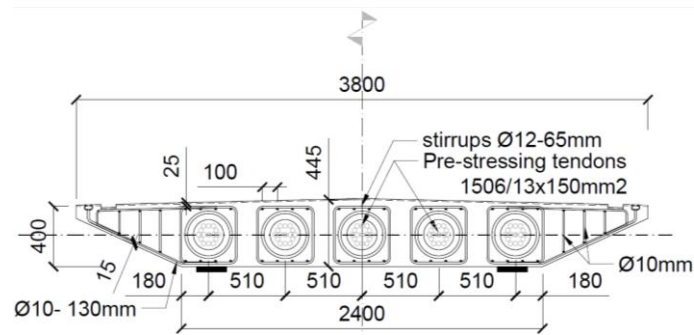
Cross-section of the end beam with anchorage for pre-stressing system.
